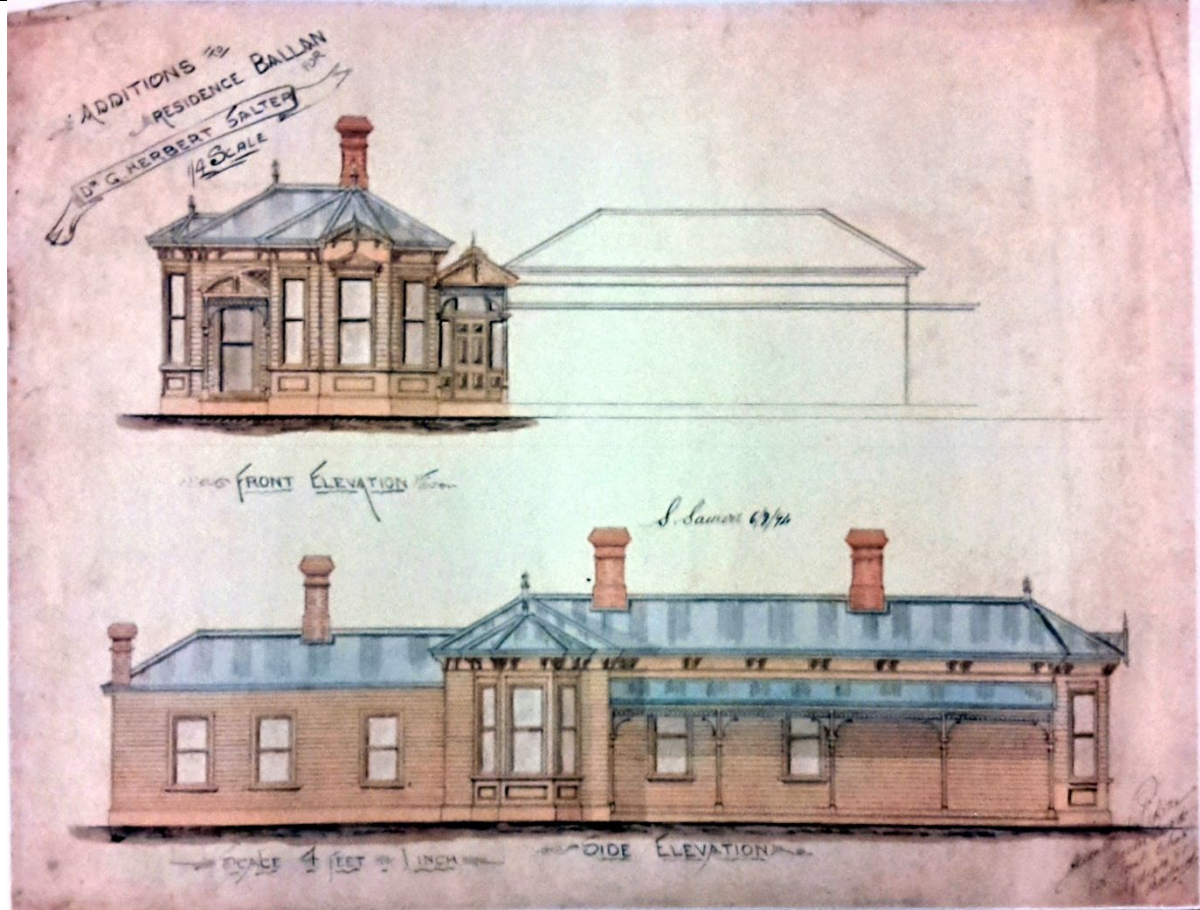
James and Piper architects, Ballarat: Front & Side Elevation Drawings for additions to Dr Salter's residence, Ballan, 1894.
